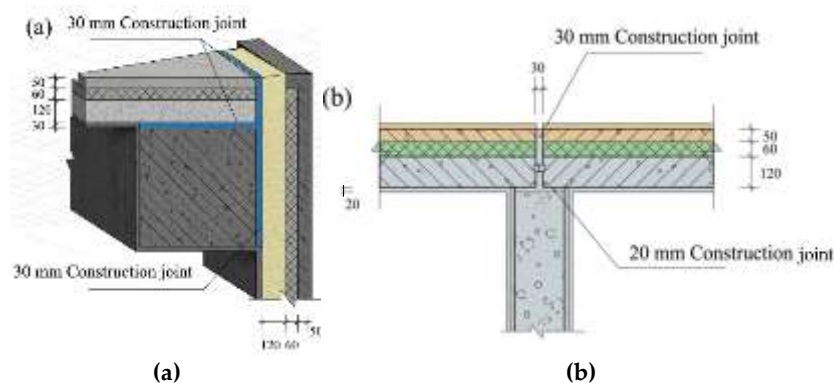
Configuration of connection between exterior walls. (a) Exterior Wall - Exterior Wall (b) Exterior Wall - Interior Wall.
